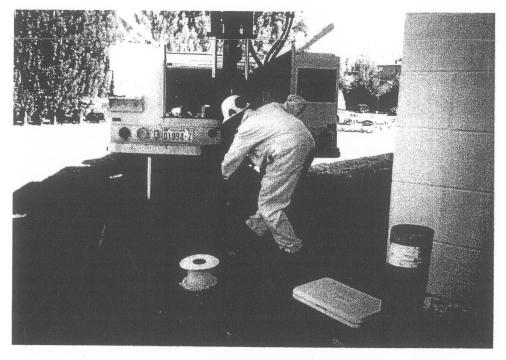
Drilling Borehole #5; six (6) feet from the northeast corner of the structure
